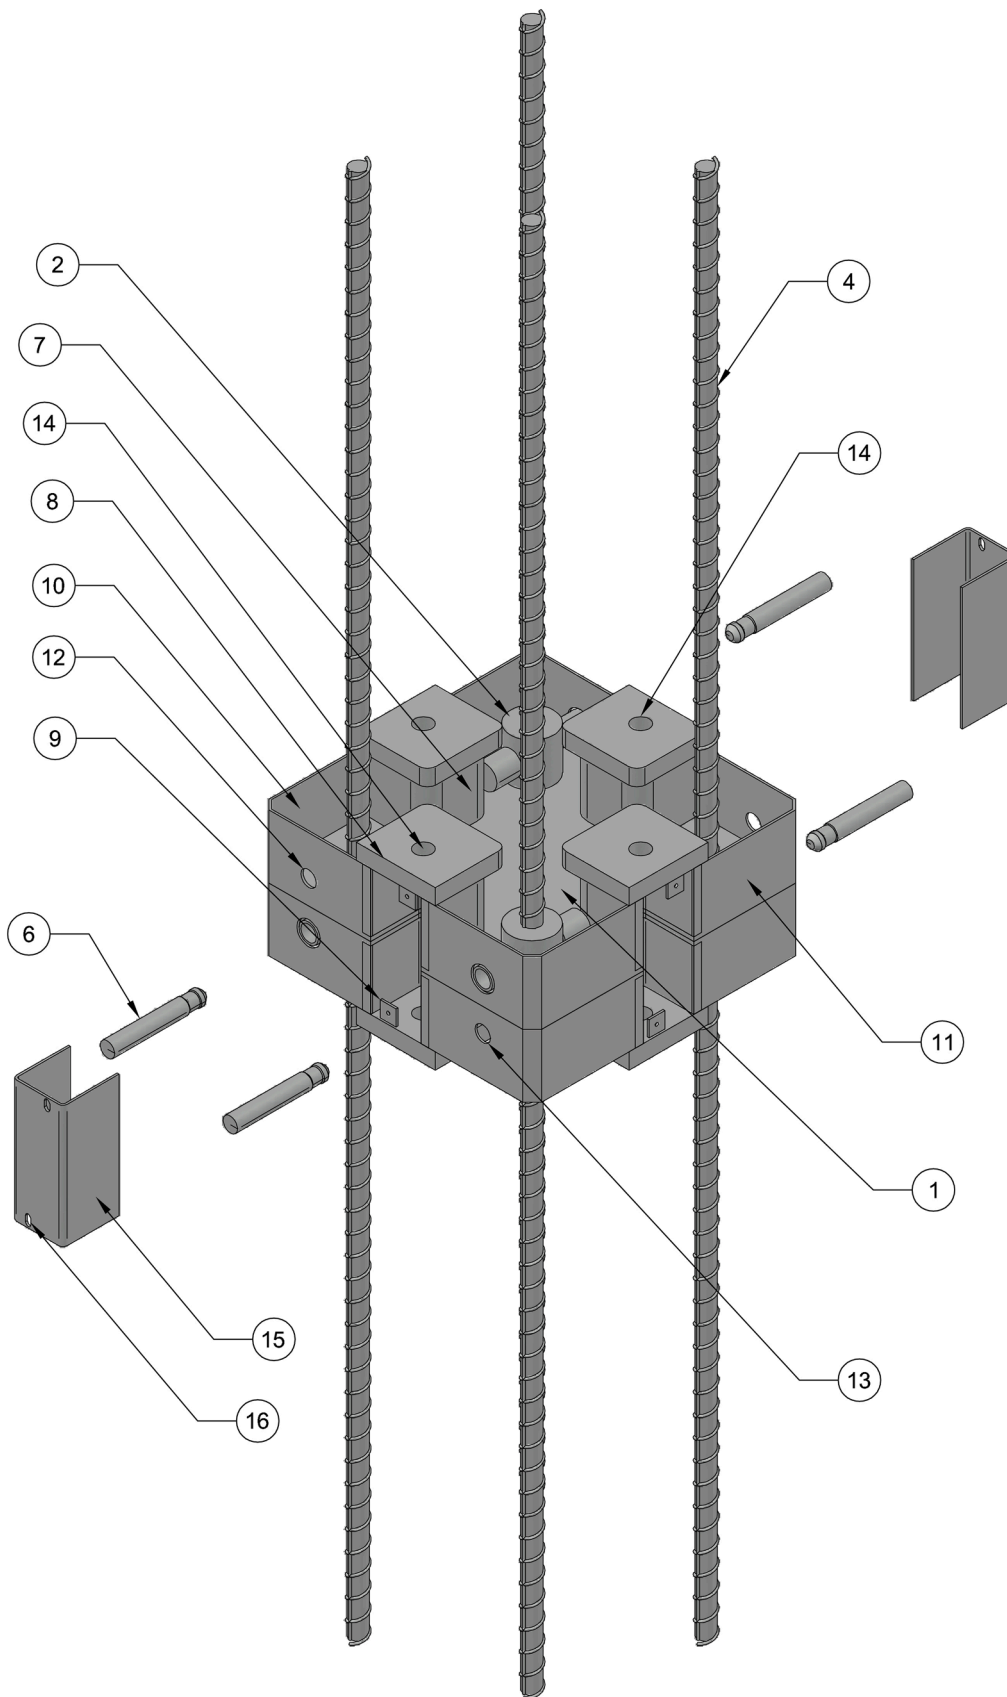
Isometric view of assembled 350-mm DEP joint.
